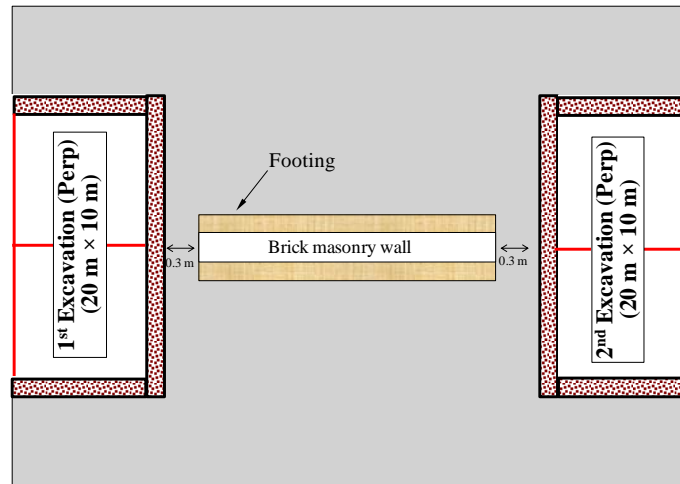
Plan view of the twin excavations (i.e., perpendicular) adjacent to the existing brick masonry wall
